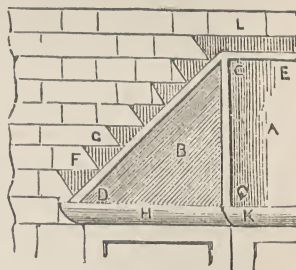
FLASHINGS IN ZINC ROOF TO BAY WINDOWS.
